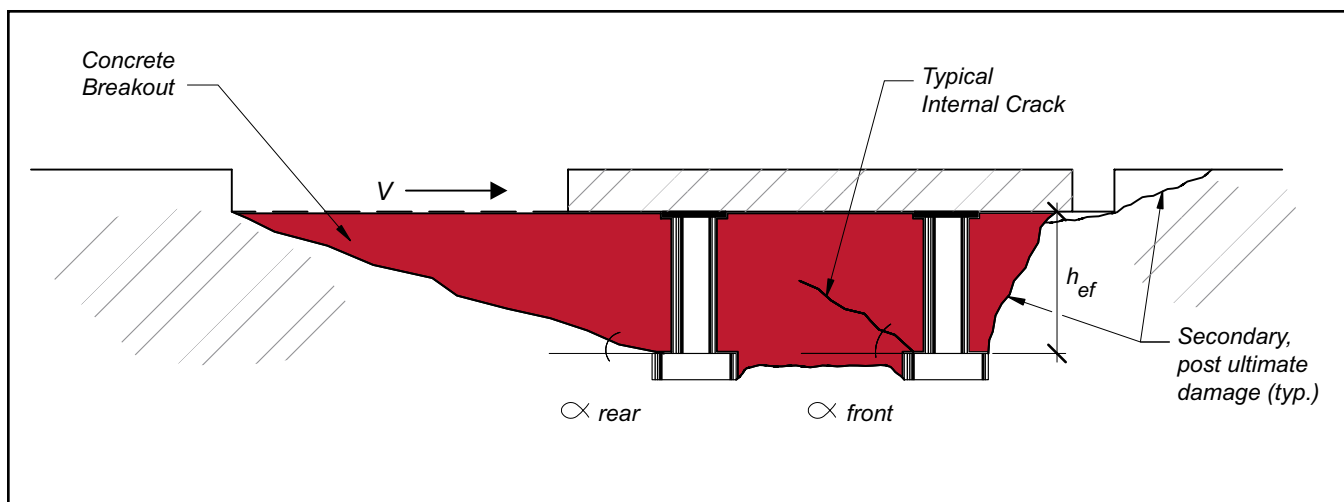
Typical failure behavior of a pryout connection illustrating the “kick-back” deformation mechanism defining the ultimate failure mode.
